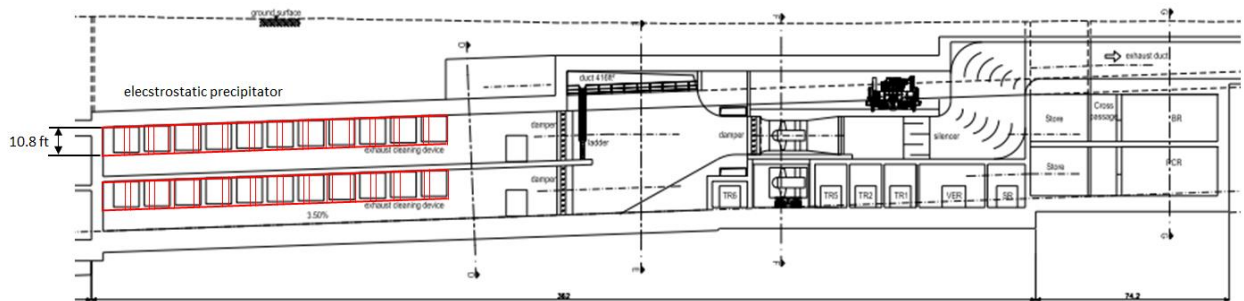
Spacing of EP Air Cleaning Equipment, Portal Building North, Longitudinal Section
